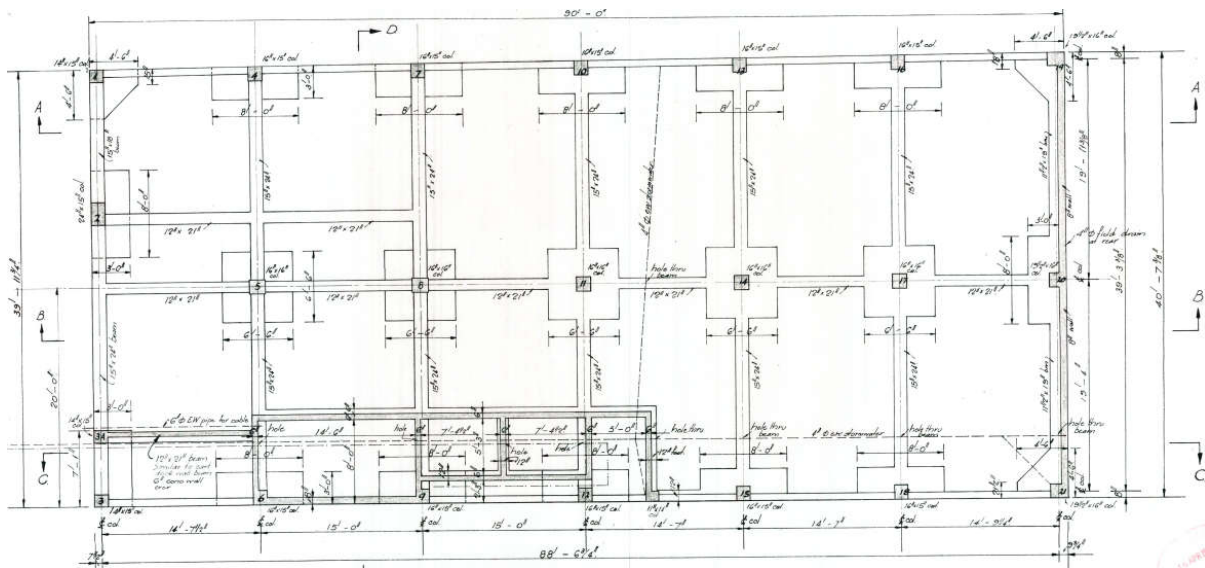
Foundation and Typical Floor Plan – Original Drawings, 1963
